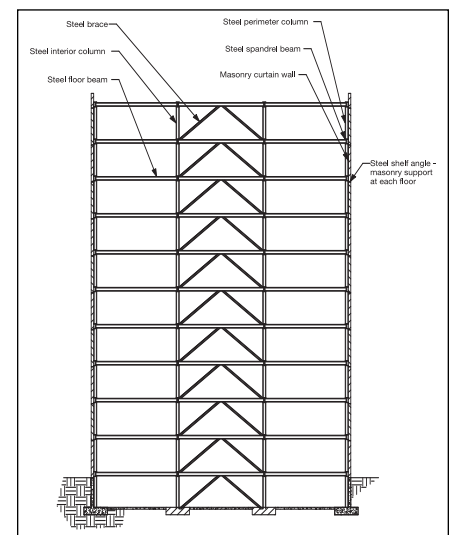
Schematic cross-section of skeleton-frame building. Drawing by the author.
